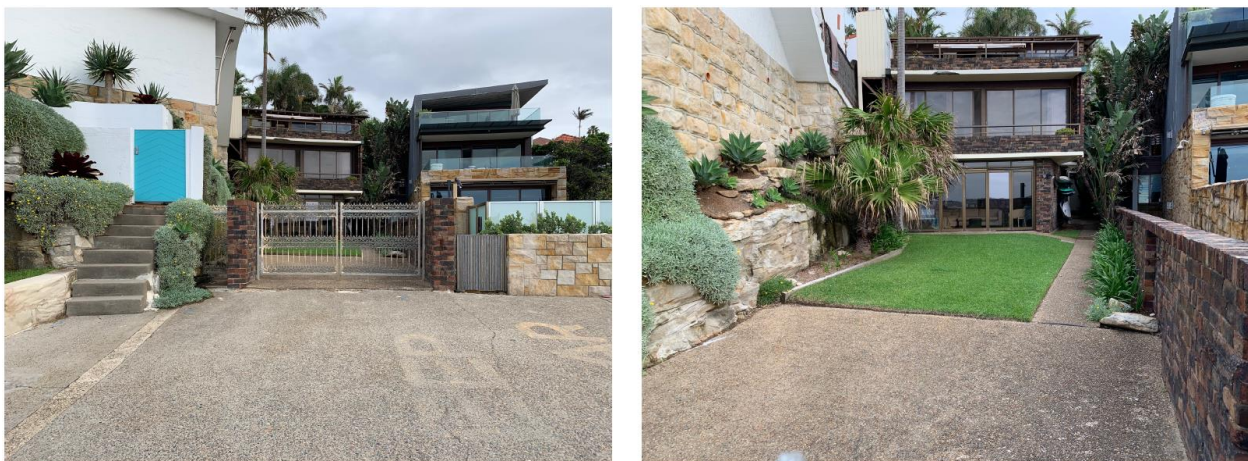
The subject site from Marine Parade (left) and the subject site and North façade of house at 88 Bower St, Manly (right).
